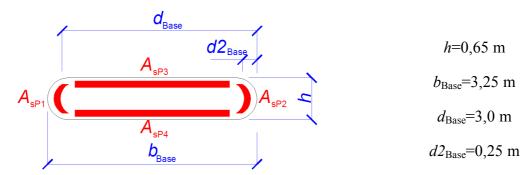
Longitudinal reinforcements at the base of the trunk
